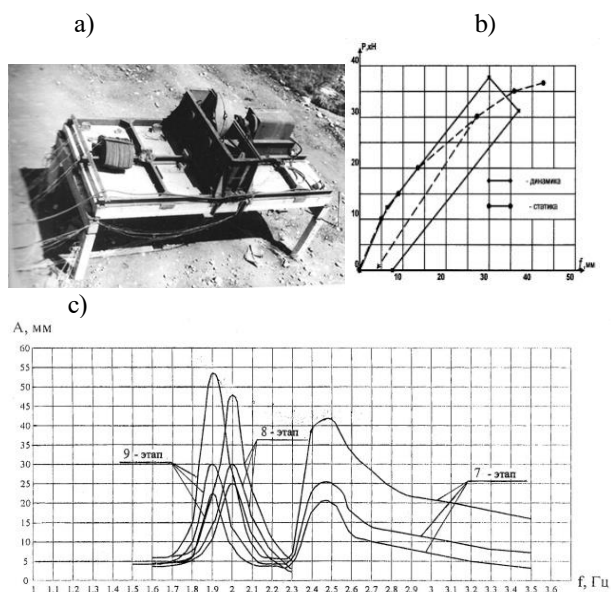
a) Testing of column caps with roller hinge assembly; b) Testing of the roller joint assembly
